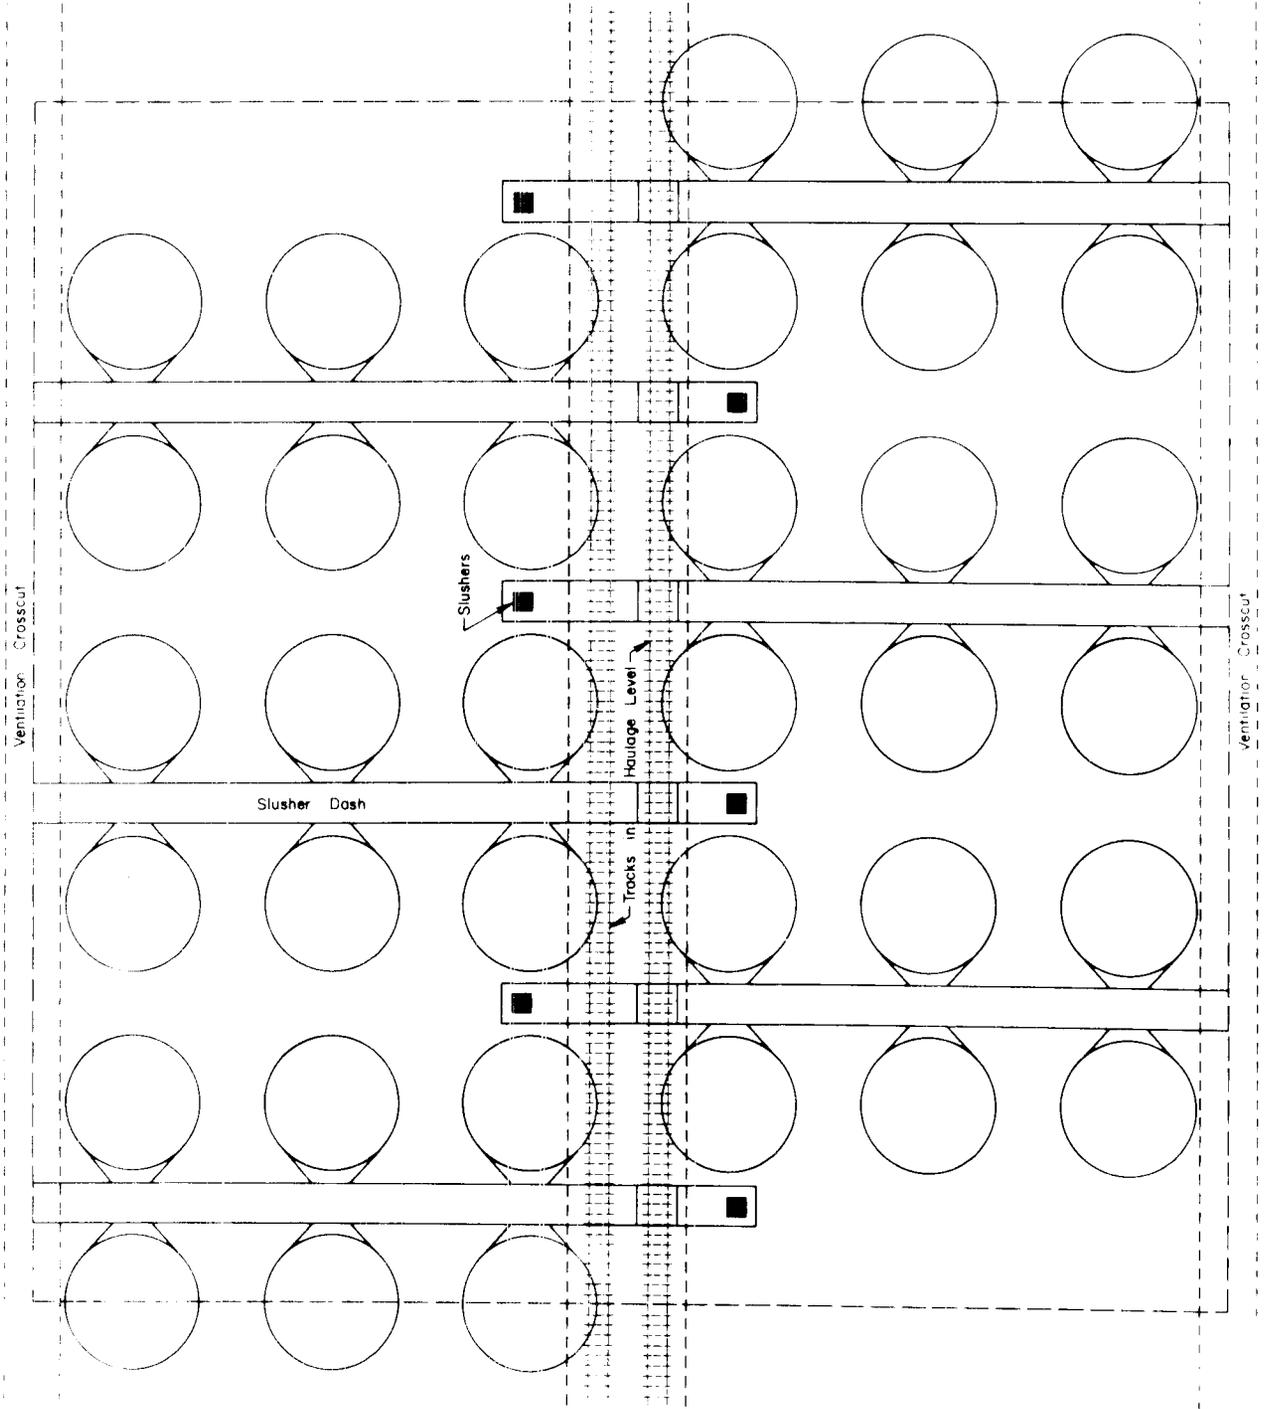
Plan View of Slusher Level within a Block, Block Caving with Slushers
